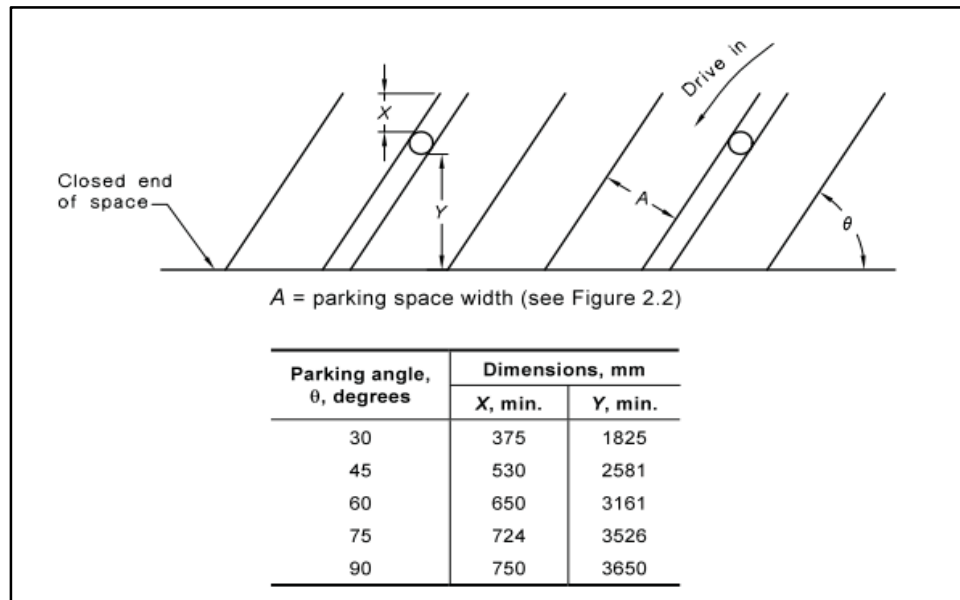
Column spacing requirements (excerpt from AS/NZS 2890.1:2004)
